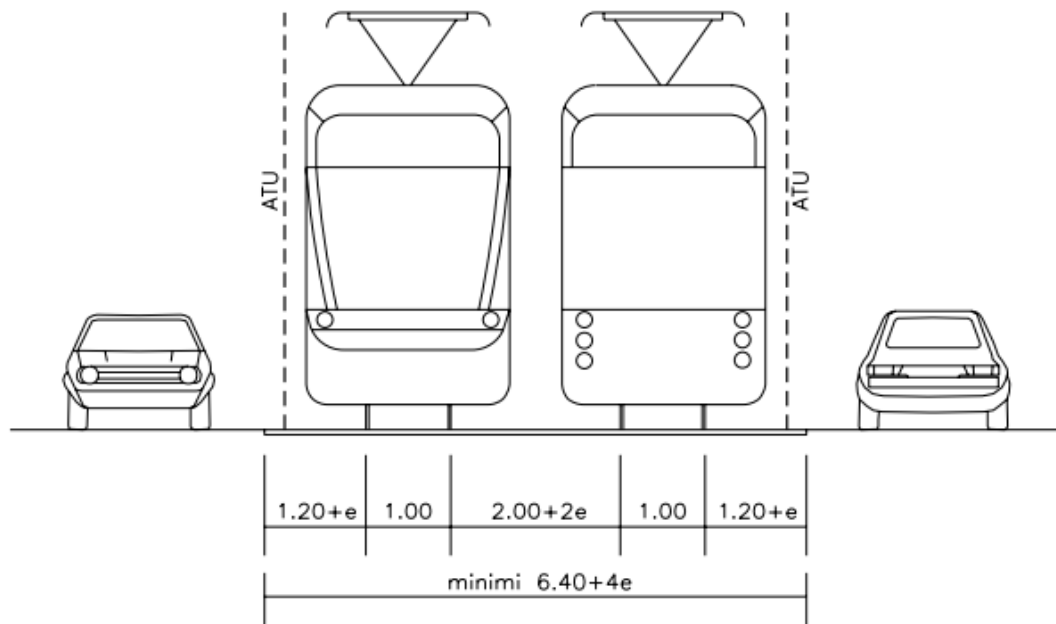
Default cross section of a tramway from the design manual (HKL 2018).
